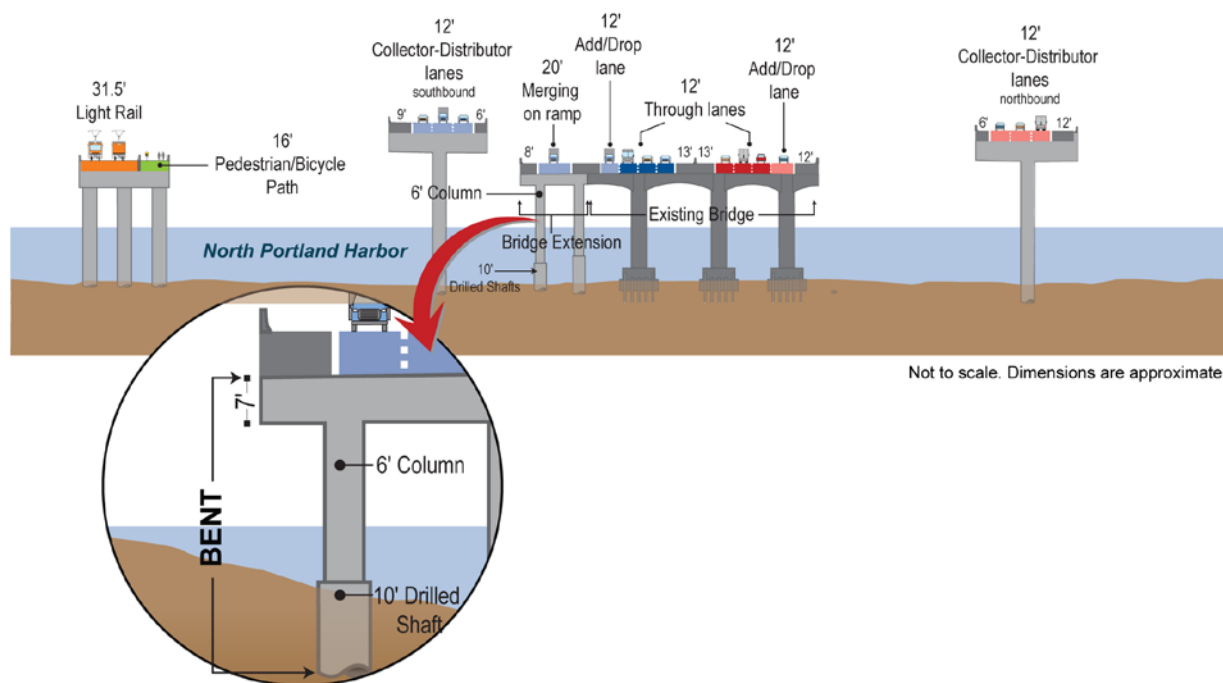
North Portland Harbor Mainline Bridge Cross-Section (Schematic)
